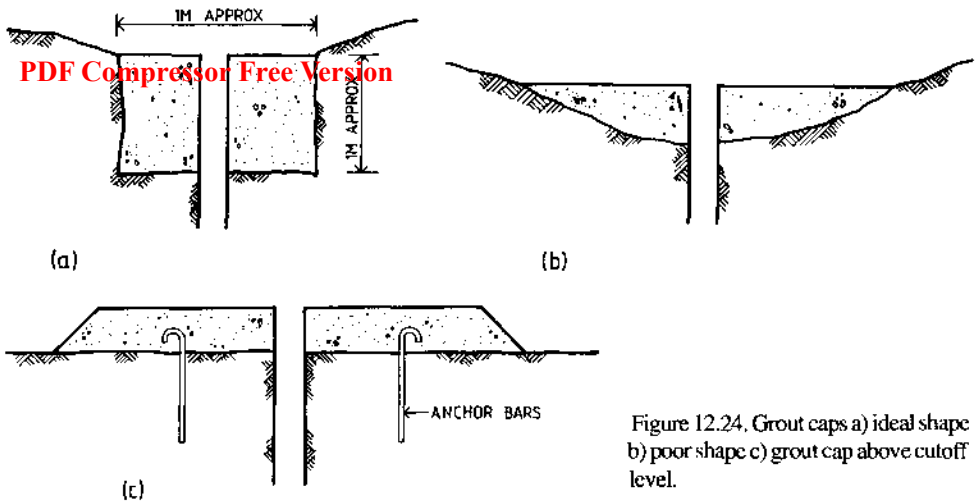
Grout caps a) ideal shape b) poor shape c) grout cap above cutoff level.
